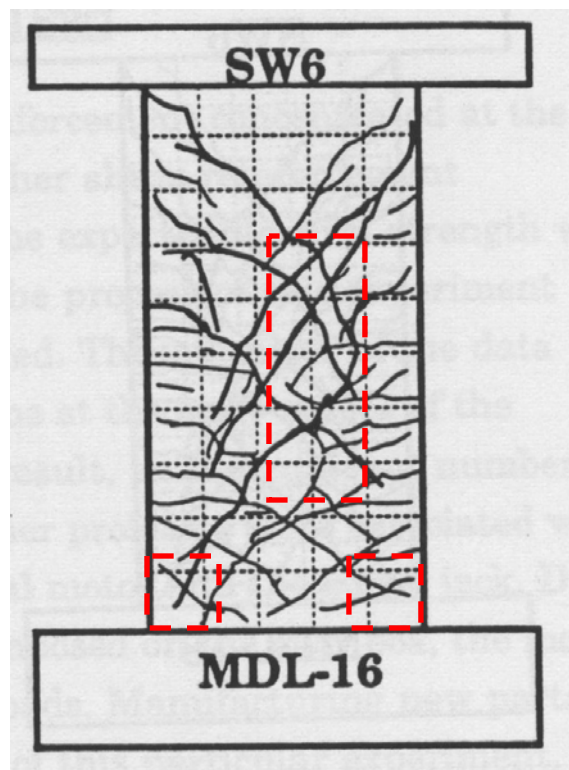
Condition of wall SW6 at 1.33% drift [Pilakoutas (1991)]
